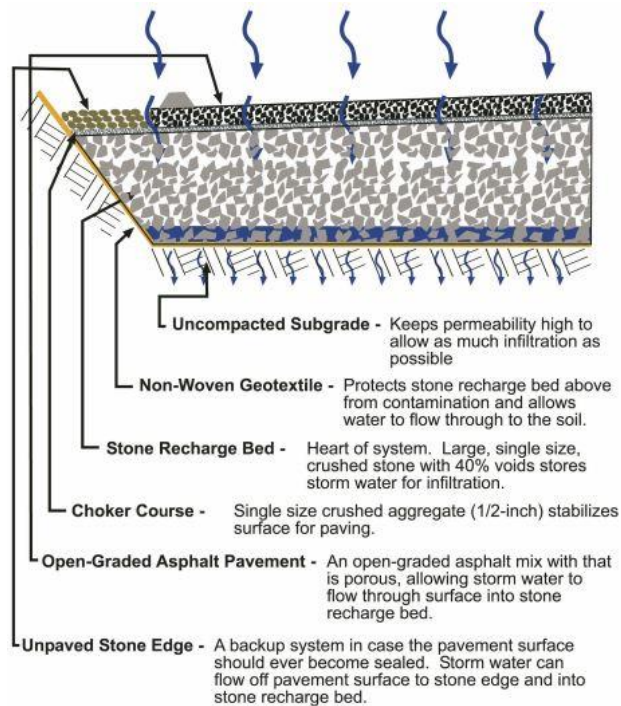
Typical Porous Asphalt cross section (National Asphalt Pavement Association n.d.)
